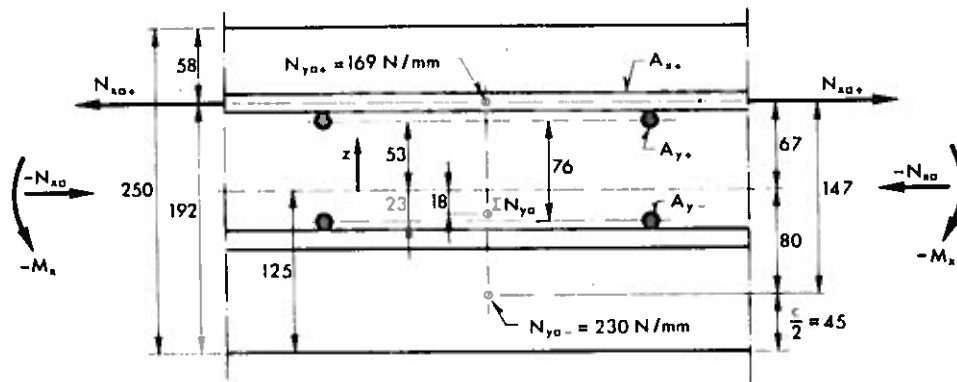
Cracked, Reinforced Concrete Section
